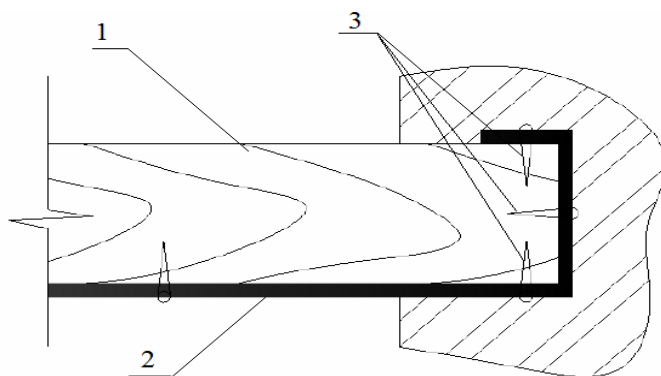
Combined beam structures of the Tirbach system: 1 – wooden beam; 2 – steel plate; 3 – dowels
